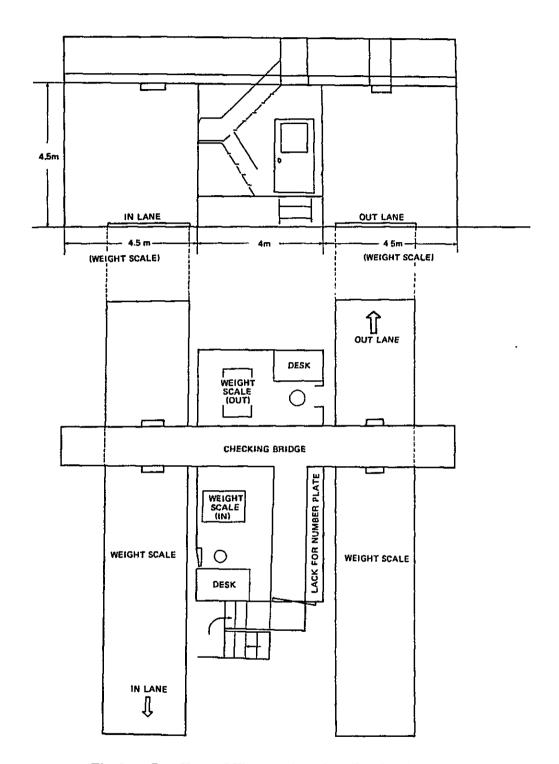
Gate House Office and Container Top Checking Bridge
